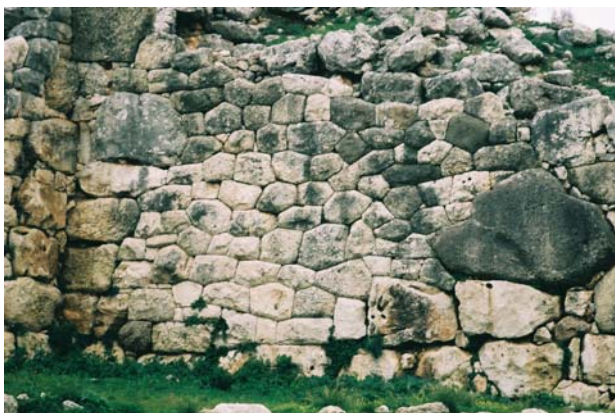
Polygonal masonry construction (in the center) used to repair section of Cyclopean masonry (left and right) at Mycenae.
